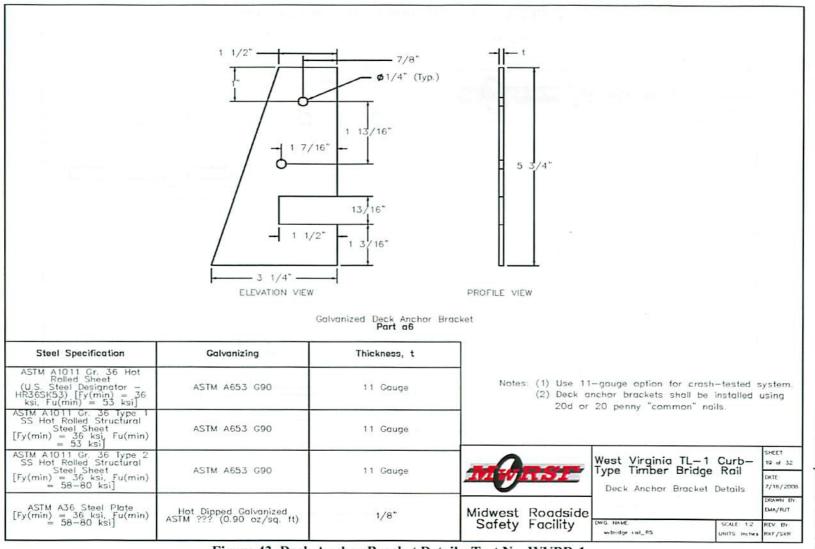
Deck Anchor Bracket Details, Test No. WVBR-1
